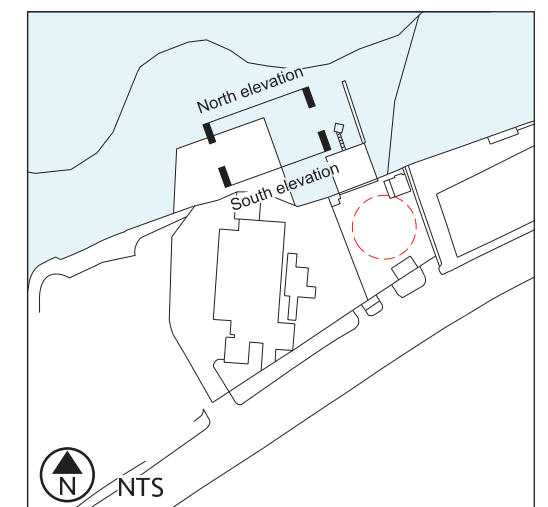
Proposed river wall (not to scale) - refer to Typical river wall design intent in the *Book of Plans
